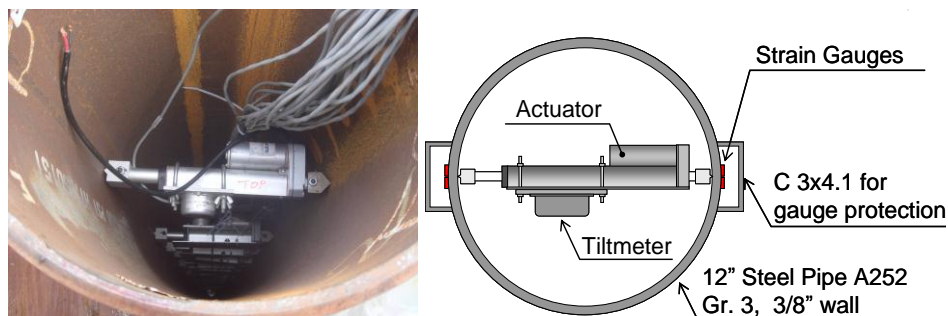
Cross-section view of test pile showing tiltmeter arrangement (after Nimityongskul, 2010)
